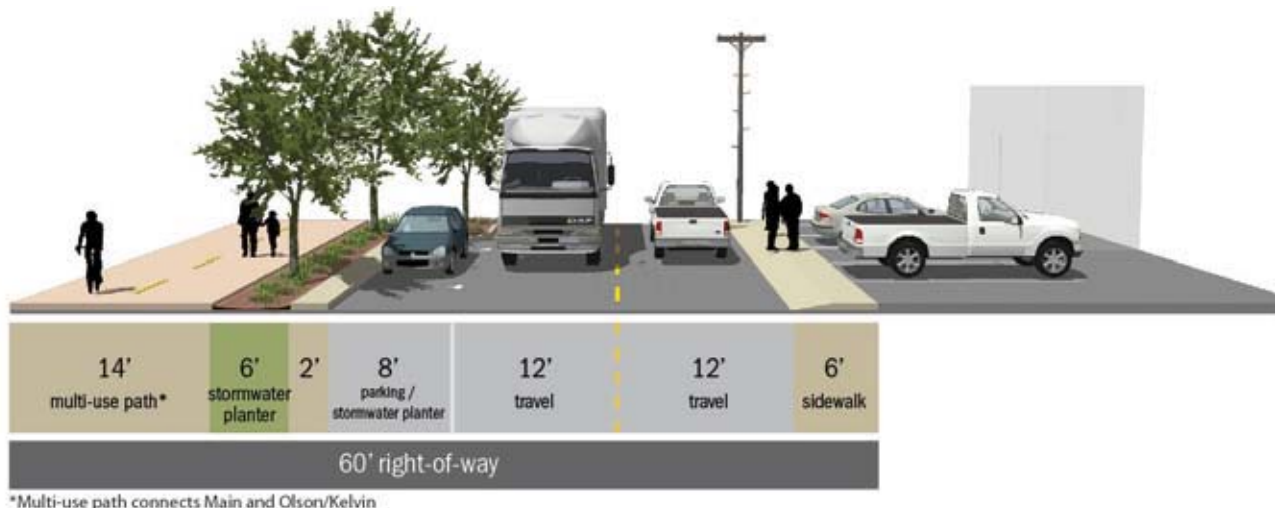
Conceptual Cross-Section for Mailwell Drive with continuous access (looking east)
